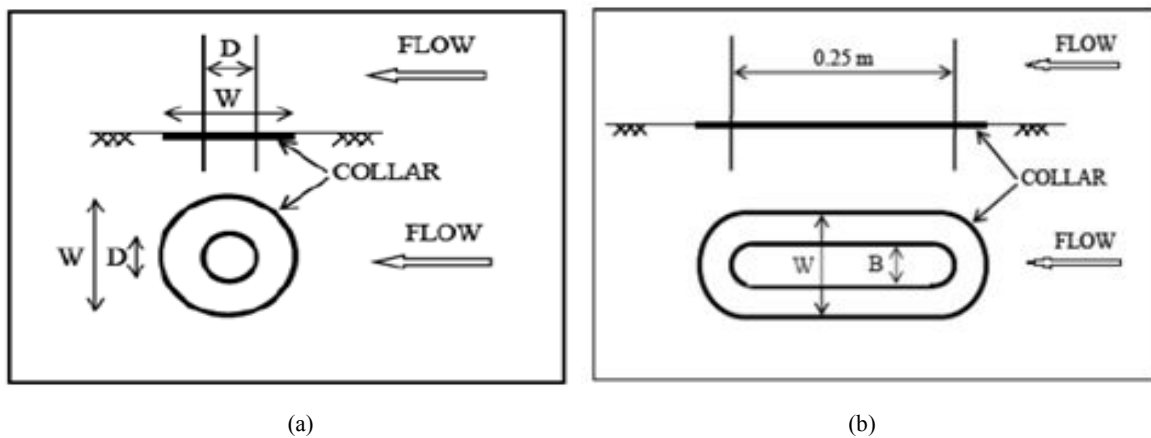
Collar installation on a) circular pier b) rectangular pier [8]
